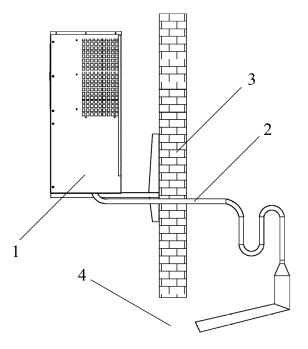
Heat pump position and assembly. 1 – Heat pump; 2 – Condense drain; 3 – Building wall; 4 – Discharge pipe
